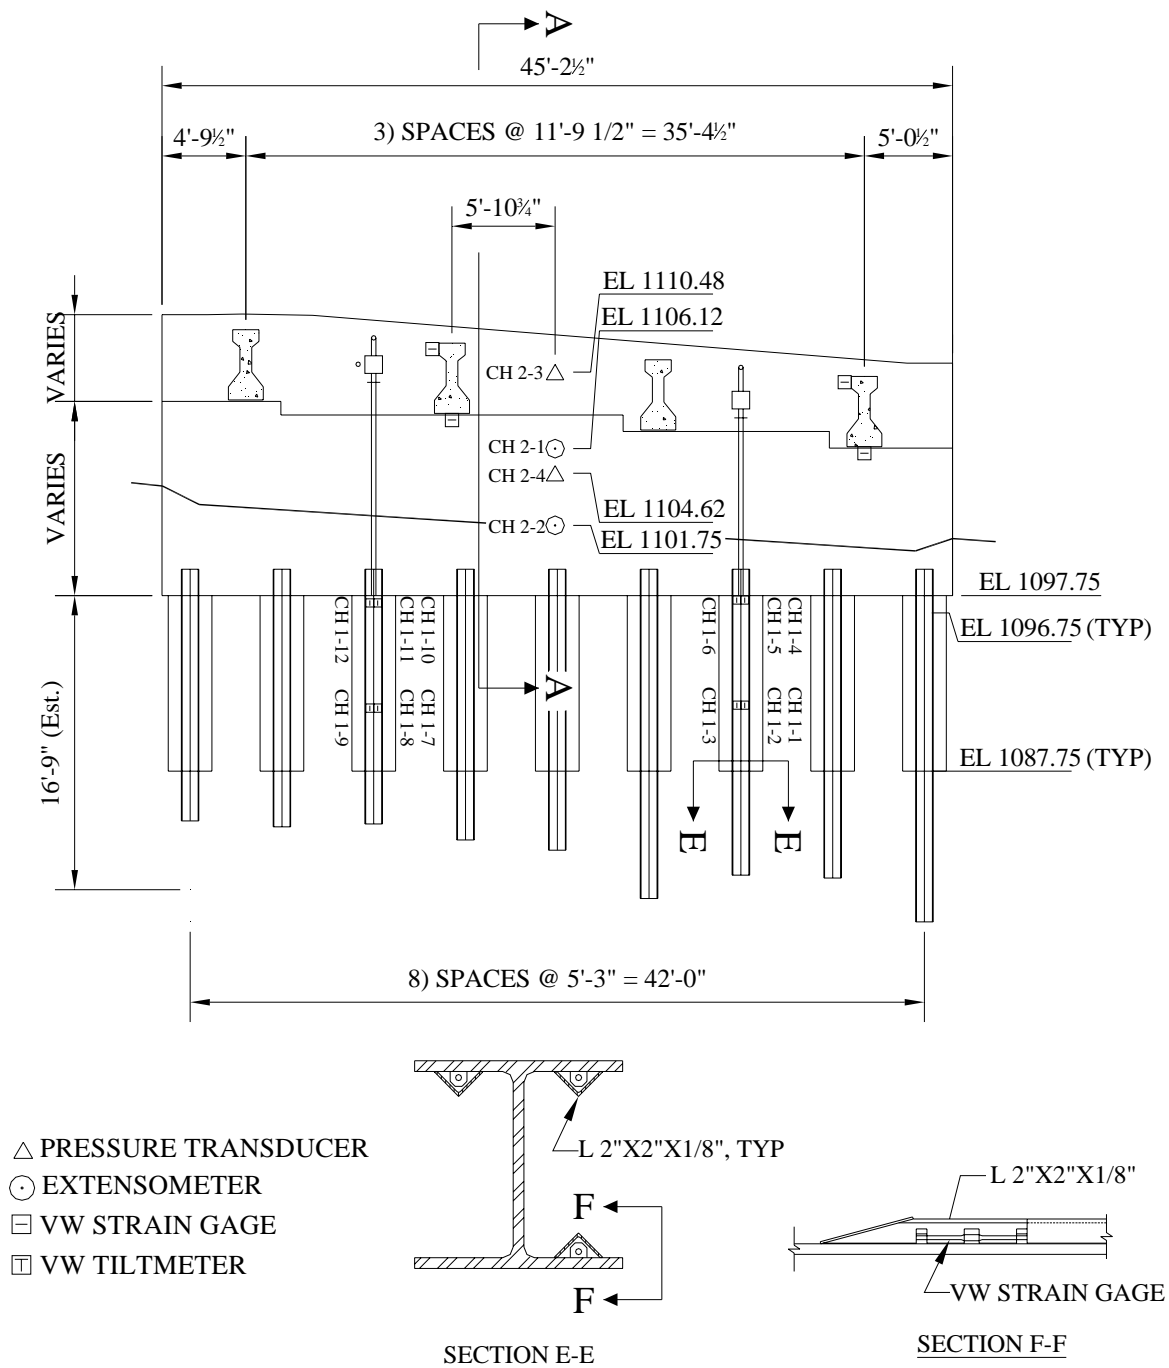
Structure 222 Abutment 2 Elevation (Section B-B).
